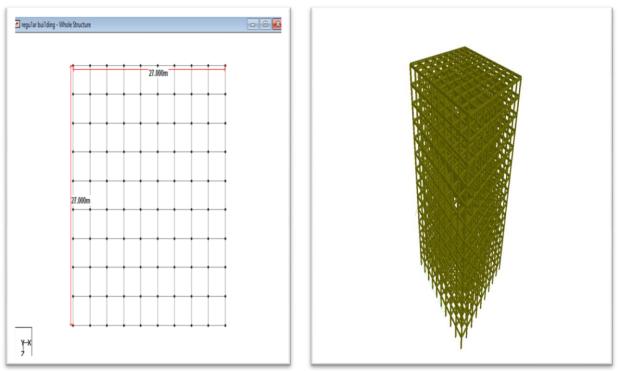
Plan and 3D View of R.C. Frame Rectangular Building
